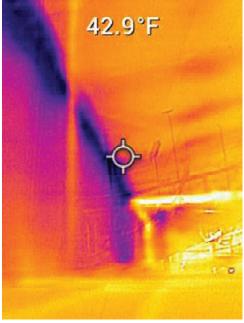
&7 – Interior ceiling plenum at exterior wall. The CMU to gyp is sealed but IR shows significant thermal leakage where the concrete meets the roof.
